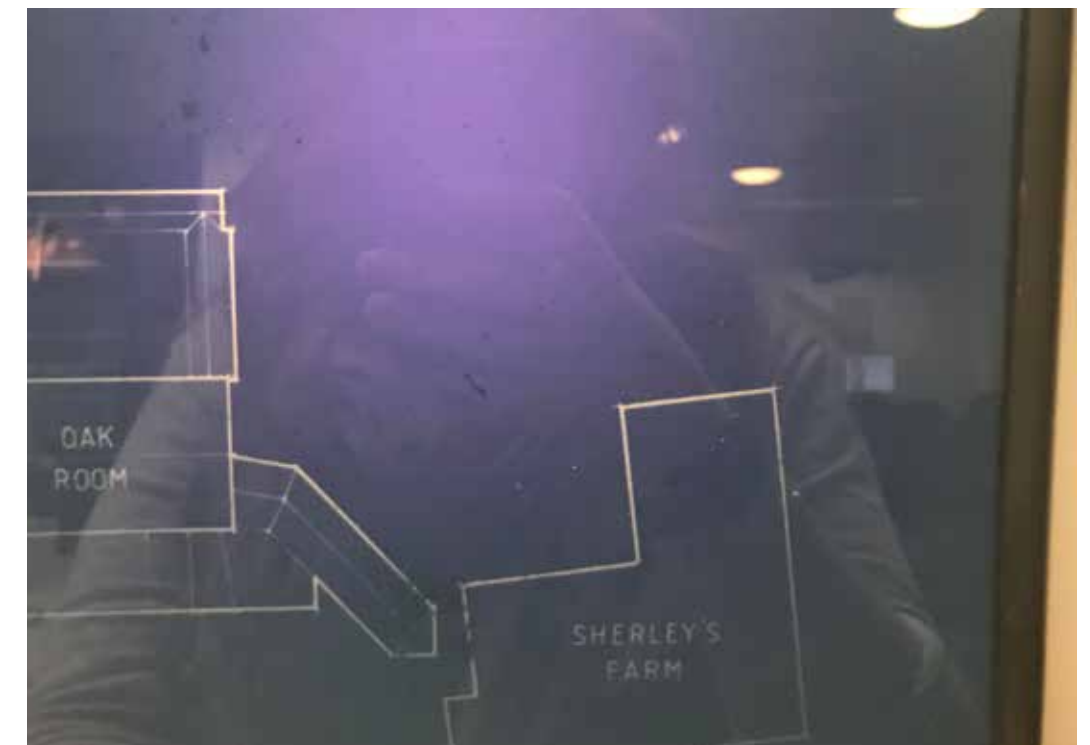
1949 application for Club Room, proposed plan, showing the single-storey extension to the north, serving to link the Oak Room with the farmhouse
